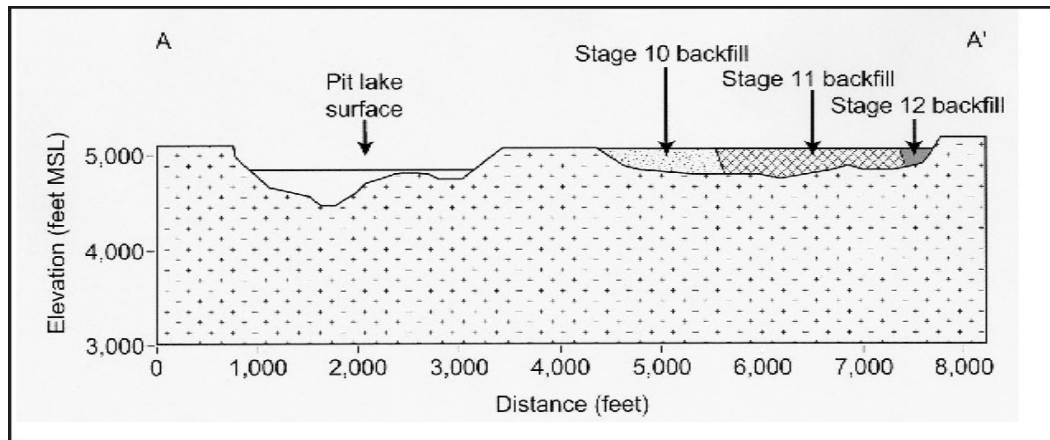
Stage 12 Cross Section A to A' through Pipeline/South Pipeline Backfilled Pit and the Gap Open Pit
